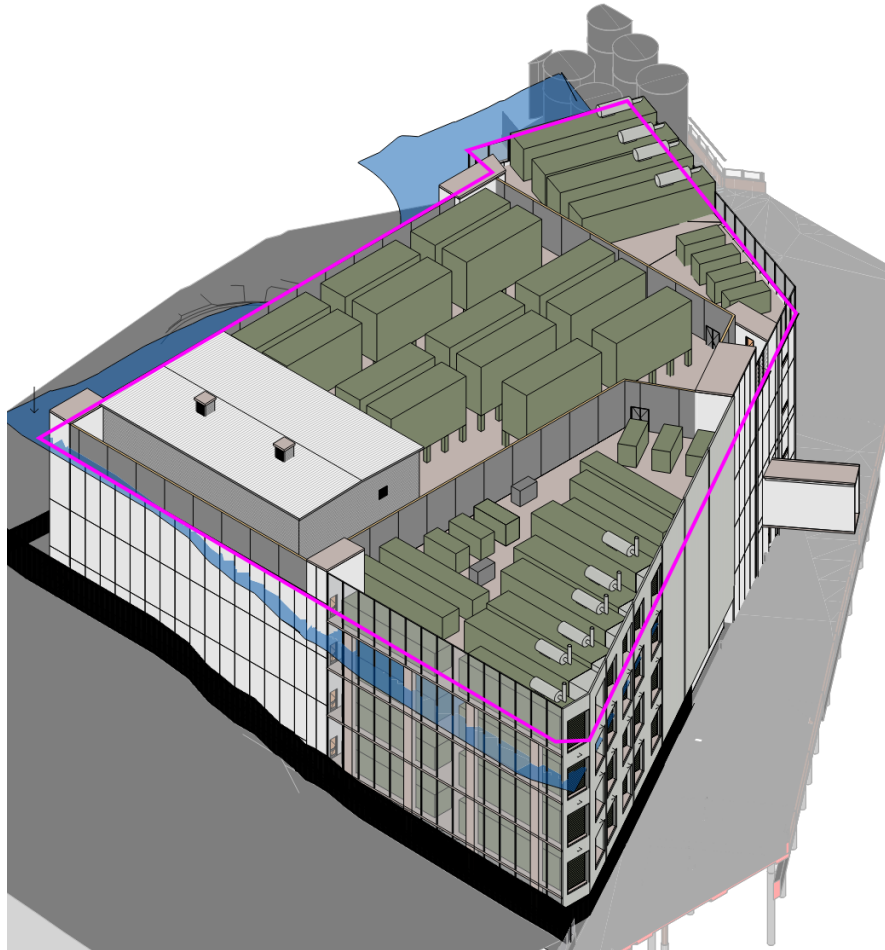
Apollo Place Data Centre Project Roof (NE)
